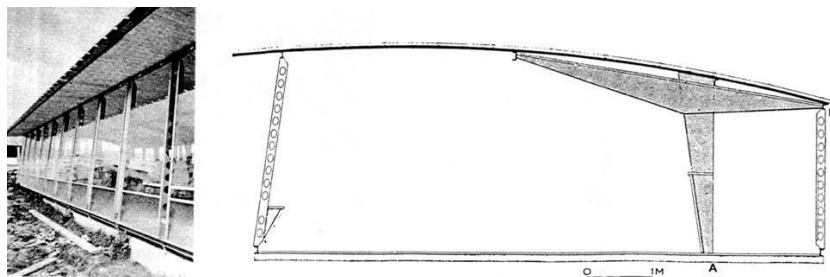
left: the classroom-side façade with the cantilevering roof overhead providing sun-shading to the glass facade. Right: the typical section showing the “béquille” support and the “poteaux aérateurs” at the facades tying the roof down to the ground as well as providing natural ventilation.
